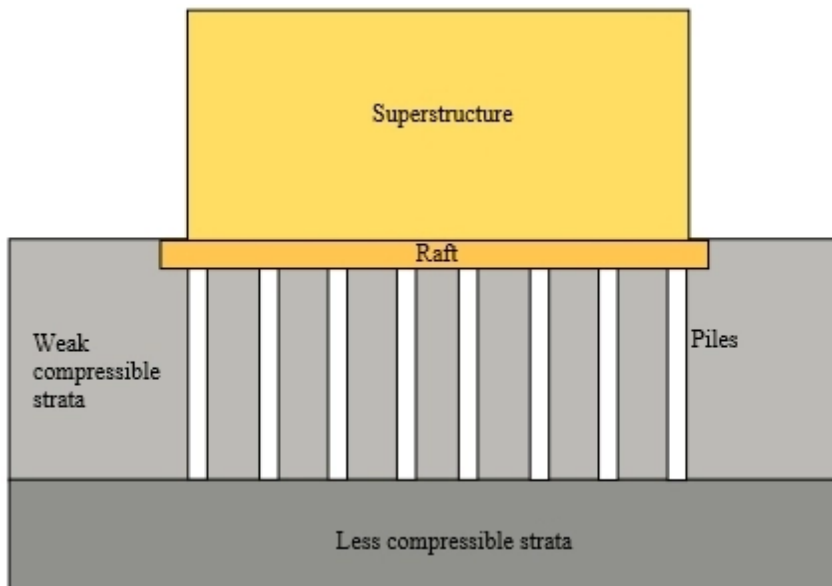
A schematic figure showing the type of foundation supporting the existing structure
